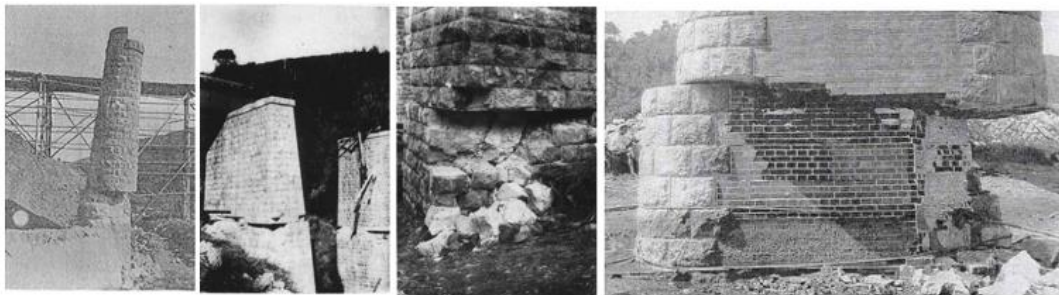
Damage of unreinforced masonry railway structures under big earthquakes
